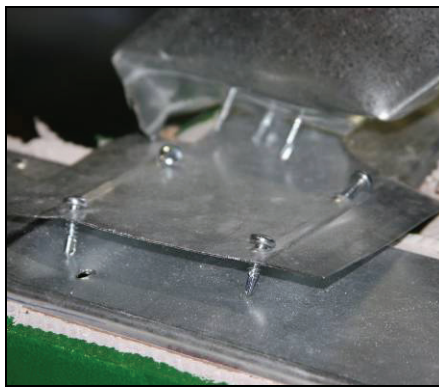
Damage of Top Track Connectors between Perpendicular Walls
